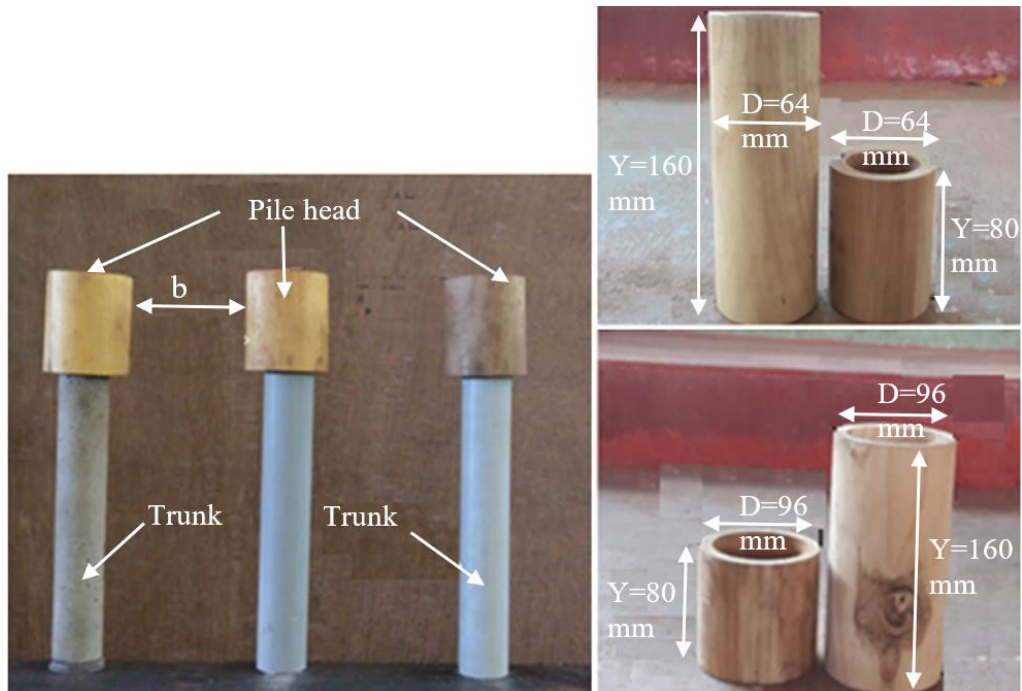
View of enlarged pile head structure model and dimensions of the enlarged head
